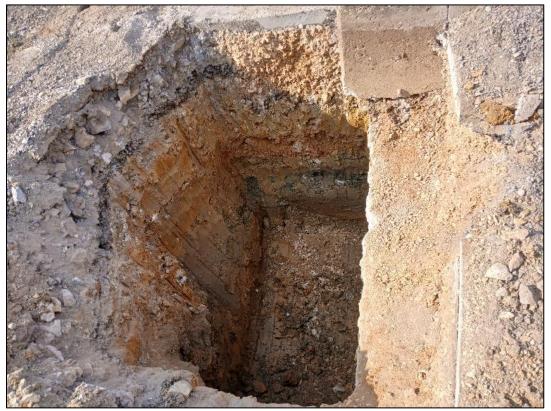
Sinkhole excavated to depth. Stable sidewalls and bottom.
